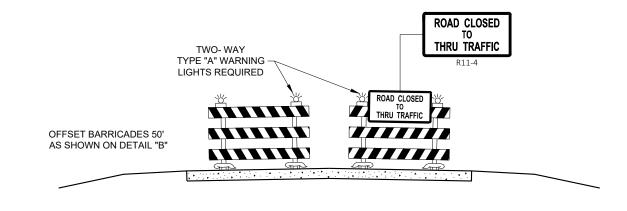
DETAIL D ROAD CLOSURE BARRICADE DETAIL APPROACH VIEW
